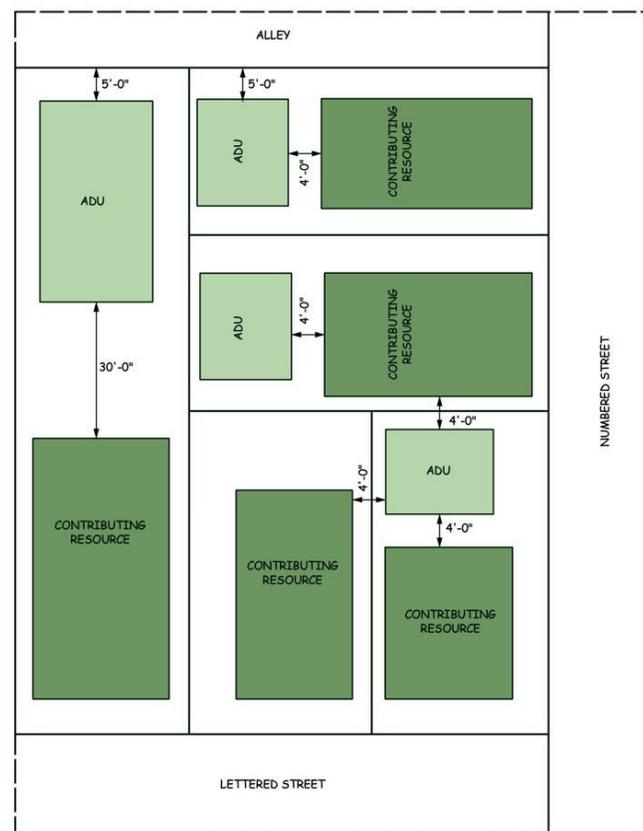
DISTANCE REQUIRED BETWEEN ADUs AND CONTRIBUTING RESOURCES FOR HISTORIC DISTRICTS IN THE CENTRAL CITY FIGURE SHOWS A TYPICAL LOT IN THE CENTRAL CITY WITH 40' x 160' OR 40' x 80' LOTS.
